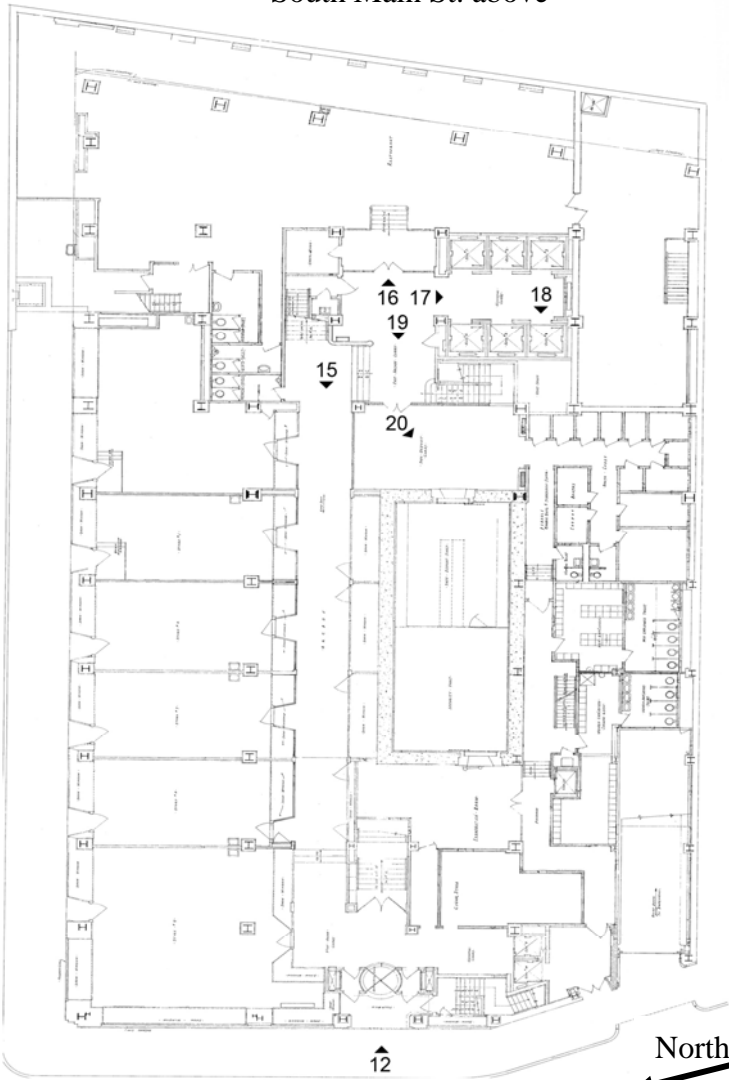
Ground floor plan (Arcade level) with key for Figures.
